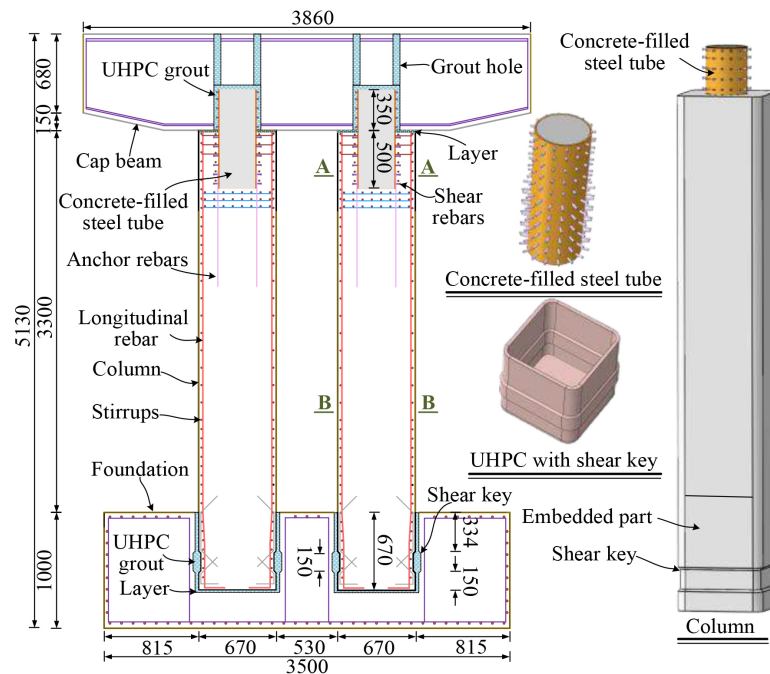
UHPC filled sleeve connected double column bridge pier system
